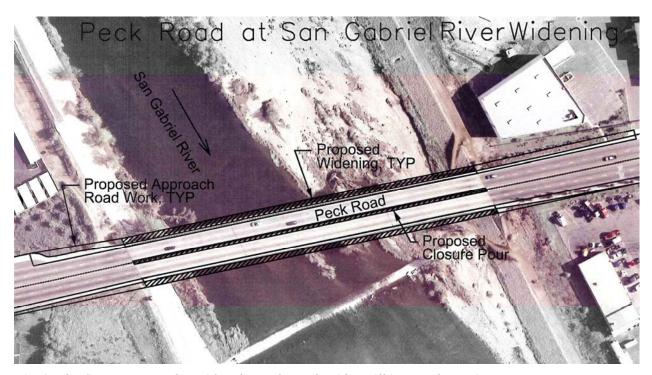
The County proposal to widen the Peck Road Bridge will impact the Project.
